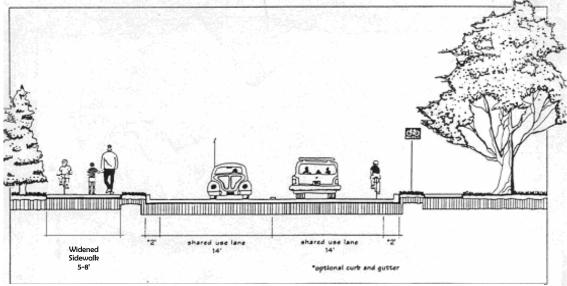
LOS 3-SHARED USE ROAD AND WIDENED SIDEWALK
